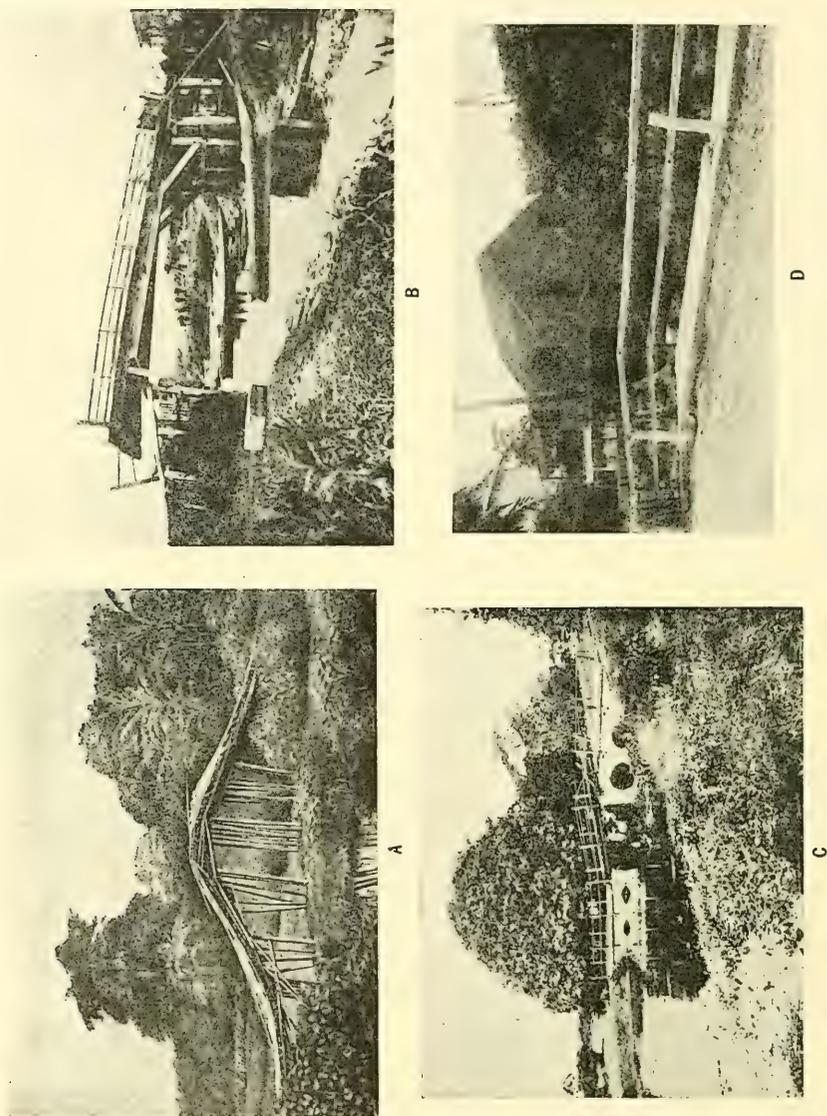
(A) Bridge over a stream at Rangpur after the Assam earthquake of 1897. The center of the stream channel has been raised (after R. D. Oldham). (B) A rustic bridge after the Schonai (Japan) earthquake of 1894, with its girder pushed up over the abutment (after Kikuchi). (C) Bridge over a canal at Rangpur after the Assam earthquake of 1897. Girder pushed up over abutment (after R. D. Oldham). (D) Bridge near Kingston damaged by approach of a butments during the Jamaica earthquake of 1907 (after Fuller).
